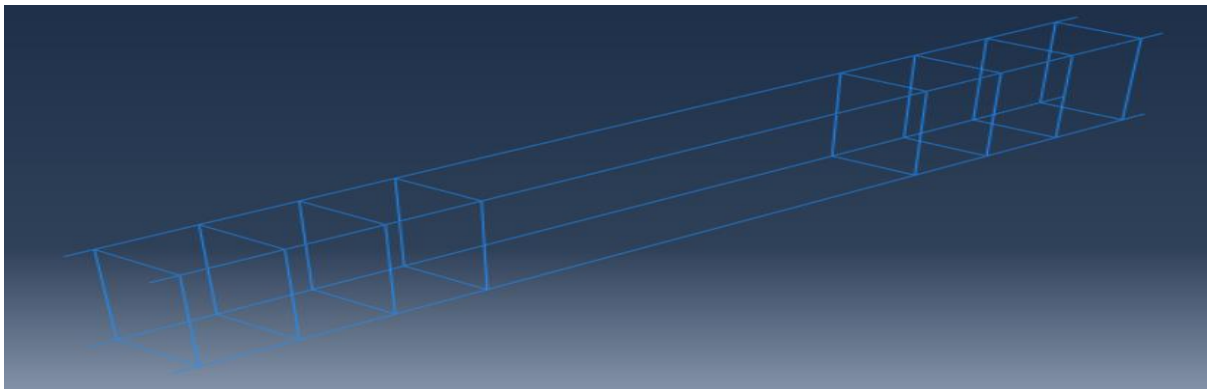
reinforcement and stirrups ϕ 8/12cm at start and end beam
